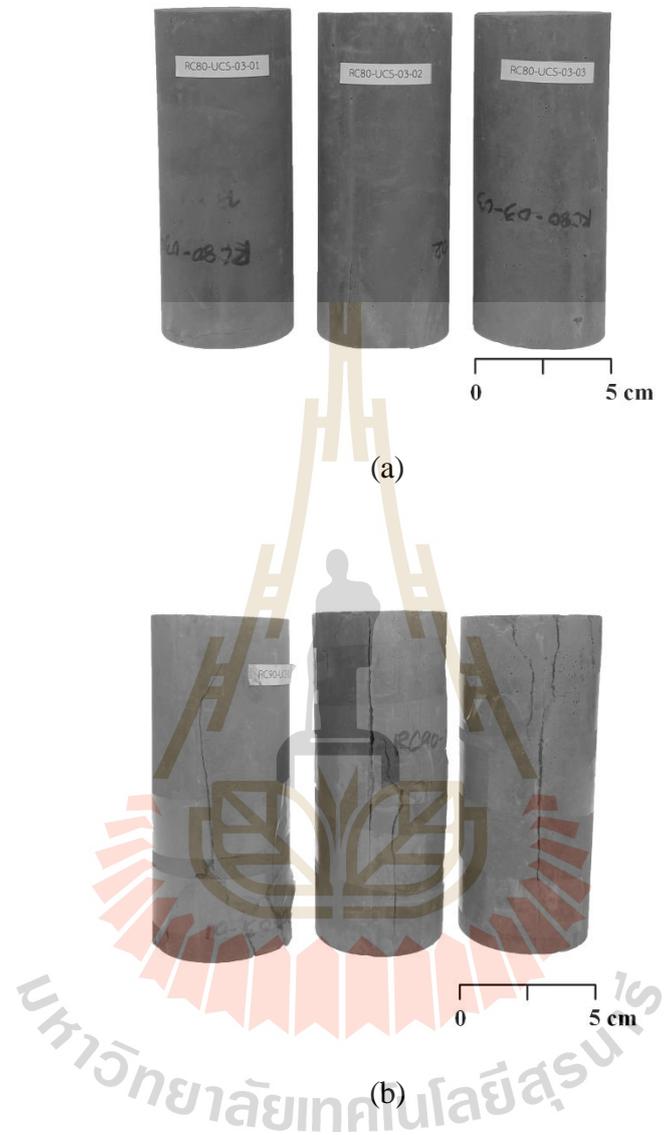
Cylindrical specimens (a) before testing and (b) after testing.
